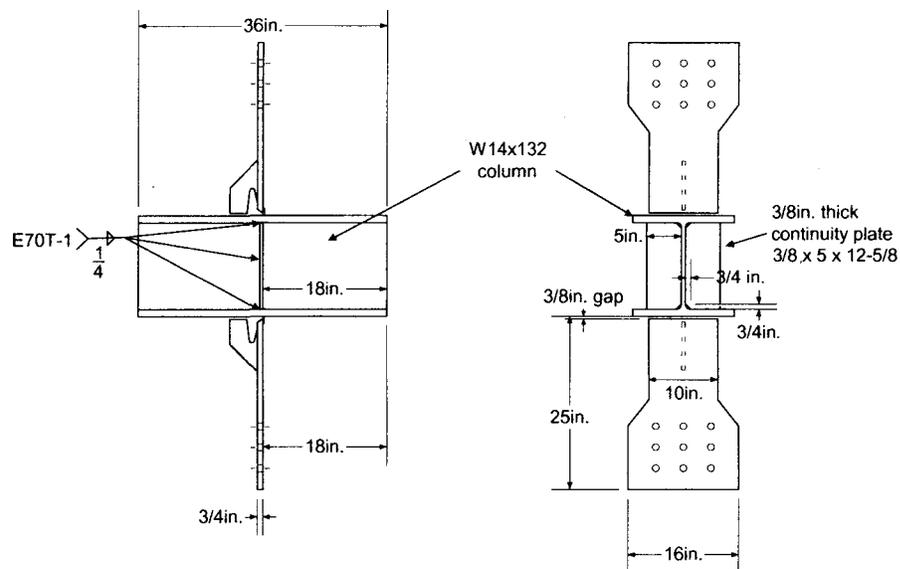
Typical pull-plate specimen with a half-thickness fillet welded continuity plate
